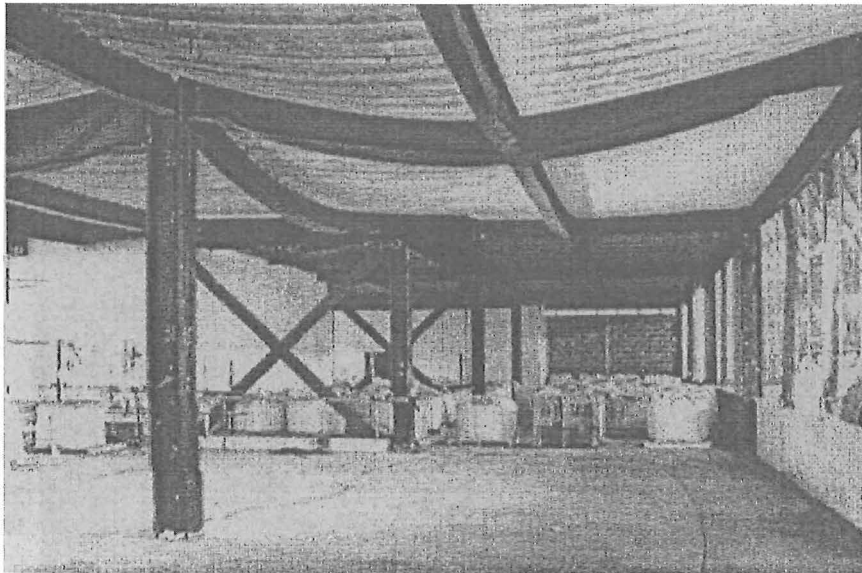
Steel beams acting as catenary members while the composite beam acts as a membrane after fire testing at Cardington (Clifton, 2001).
